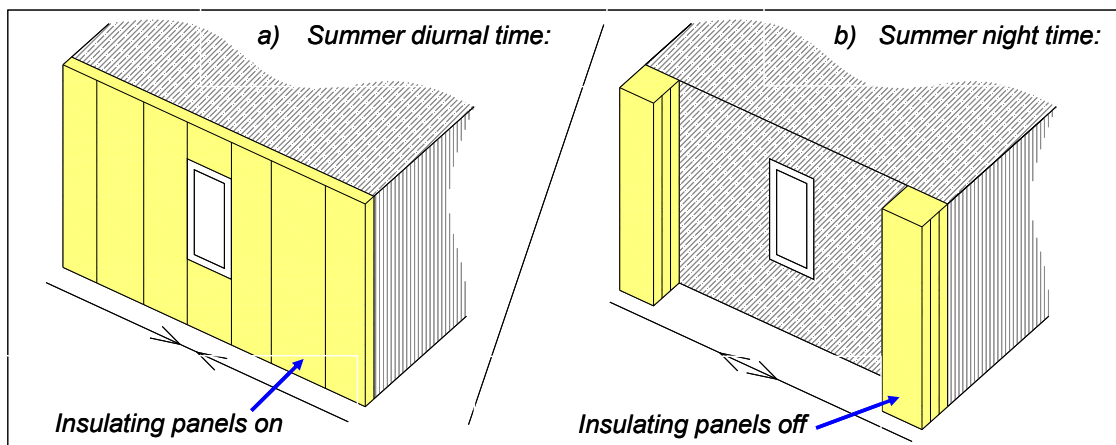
Vertical wall movable insulating panels: functional schemes
